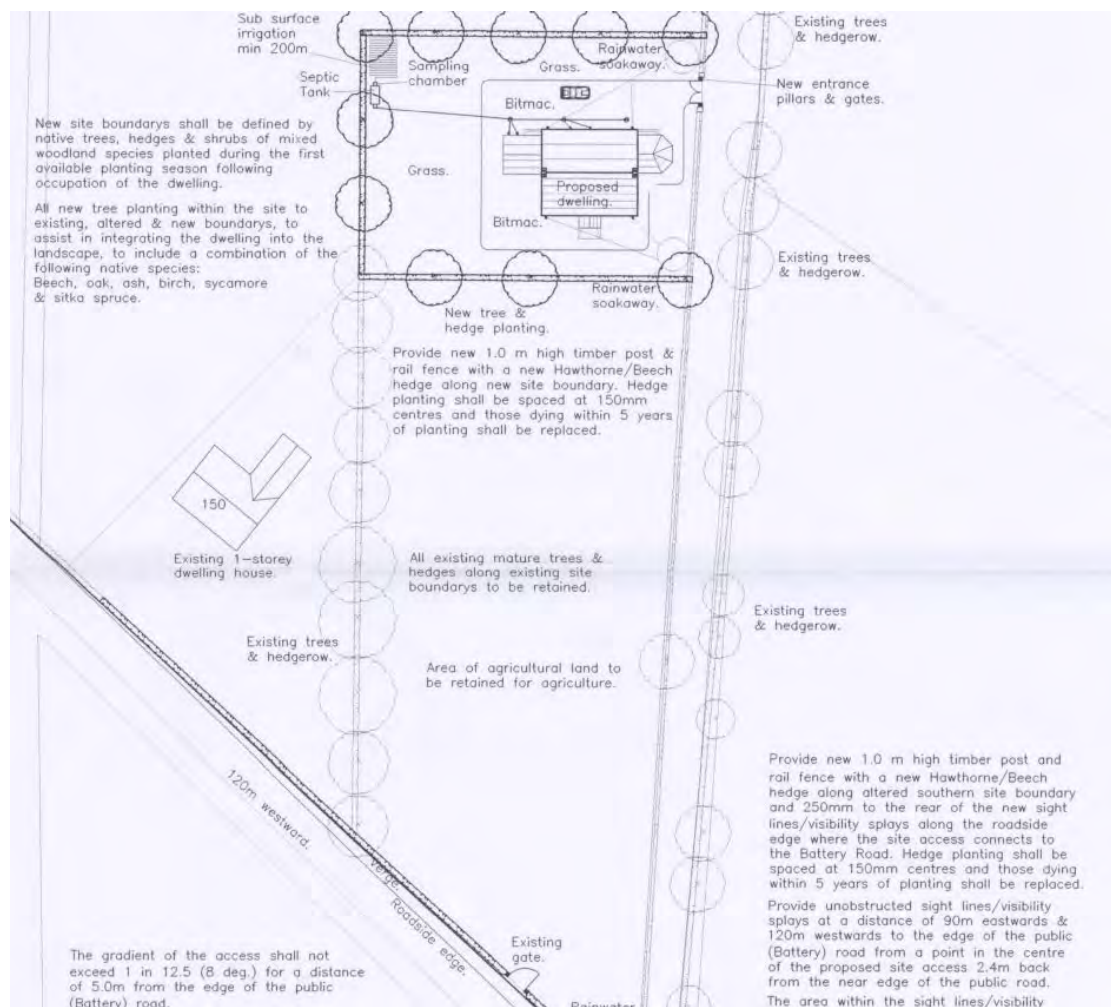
Block plan granted under planning application I/2002/0786/F show land to front of dwelling to be retained for agriculture.
